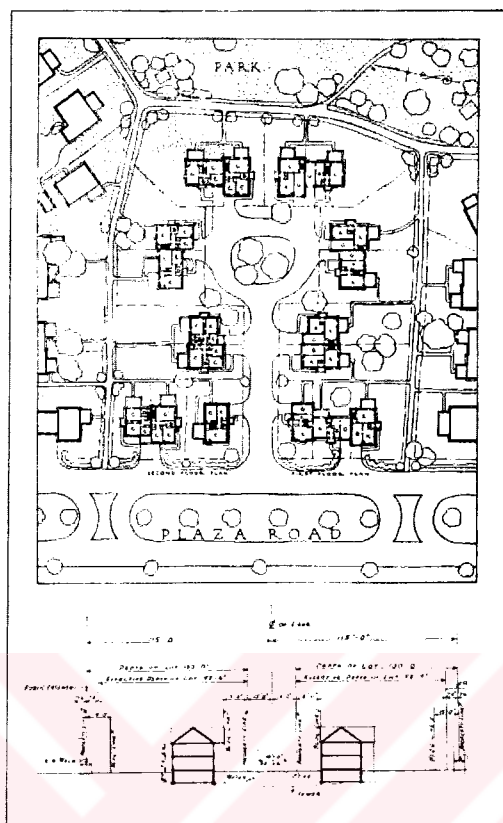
Radburn, New York: plan and typical section (Rowe, 1993: 195).
